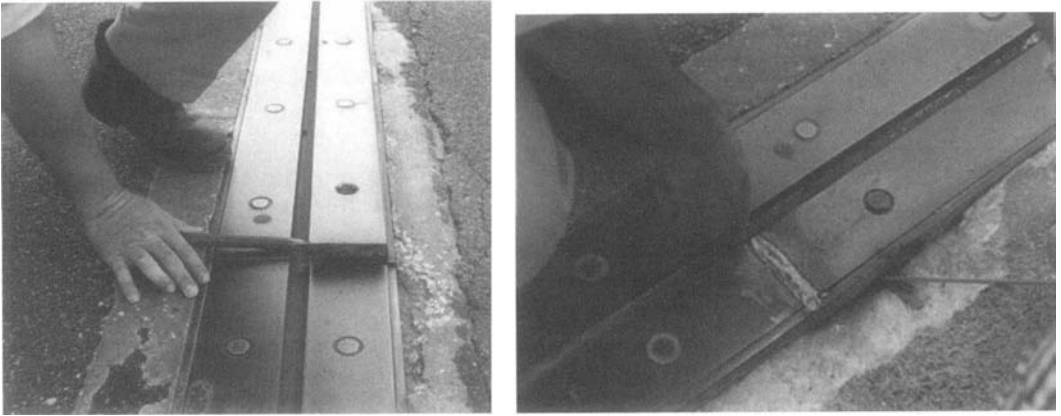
Replacement of the filler/sealant of a joint (repair technique R-F5)
